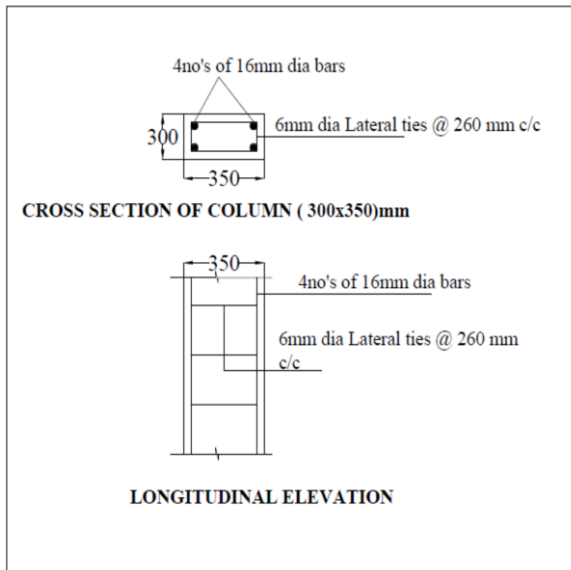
Detailing of Column (300 x 350) mm (Floating Column).
